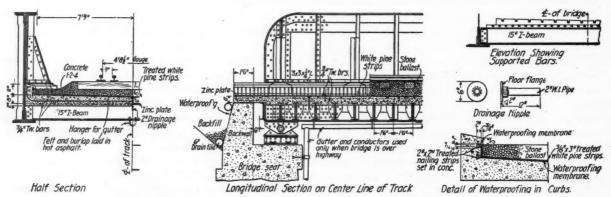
Type "A" Reinforced Concrete Floor for Through Plate Girder Spans, B. R. & P. Ry.
